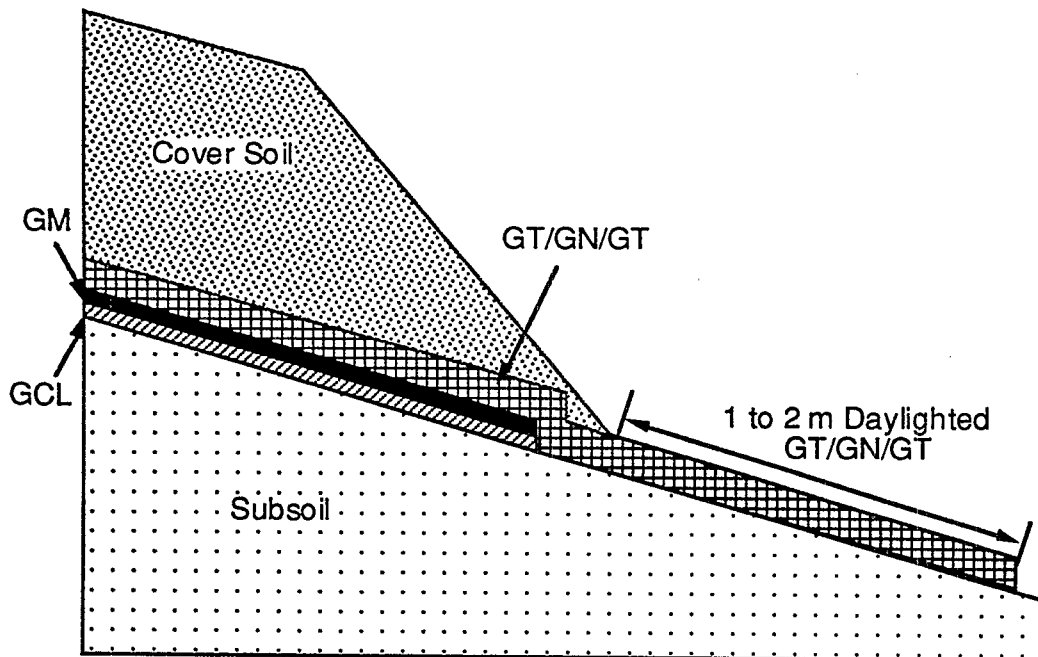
Detail of Drainage at Toe for Sections with Geonet Drainage Layer (Not to Scale).
